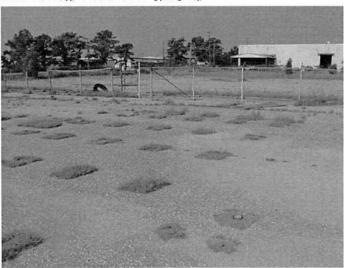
Grid pattern in asphalt; presumably from former building (facing southwest).
